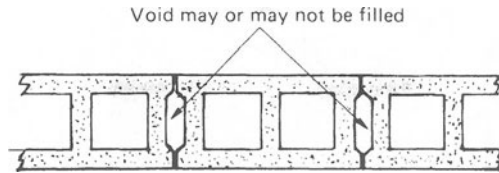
Longitudinally stressed hollow concrete blockwork
